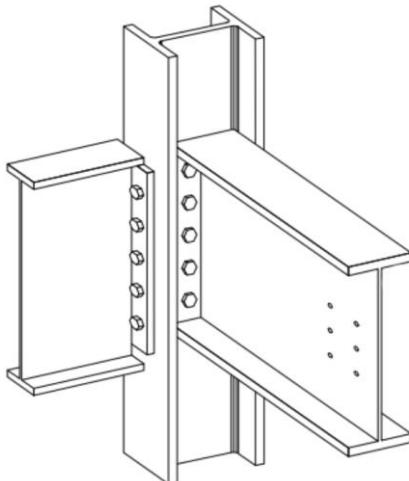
End plate connection for beam-column of different direction. Retrieved from “Joints in Steel Construction – Simple Joints to Eurocode 3” by The Steel Construction Institute (p. 10), 2014.
